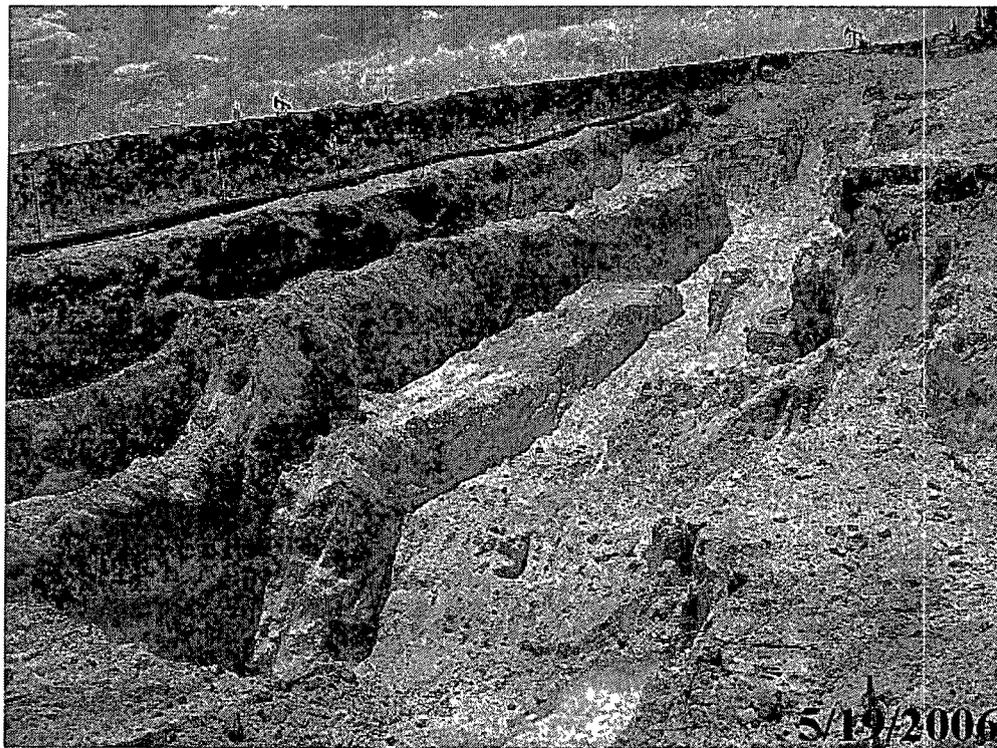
Looking westerly across Site #4 excavation. Orange pin flags on excavation sidewalls and floor indicate soil sample locations.
